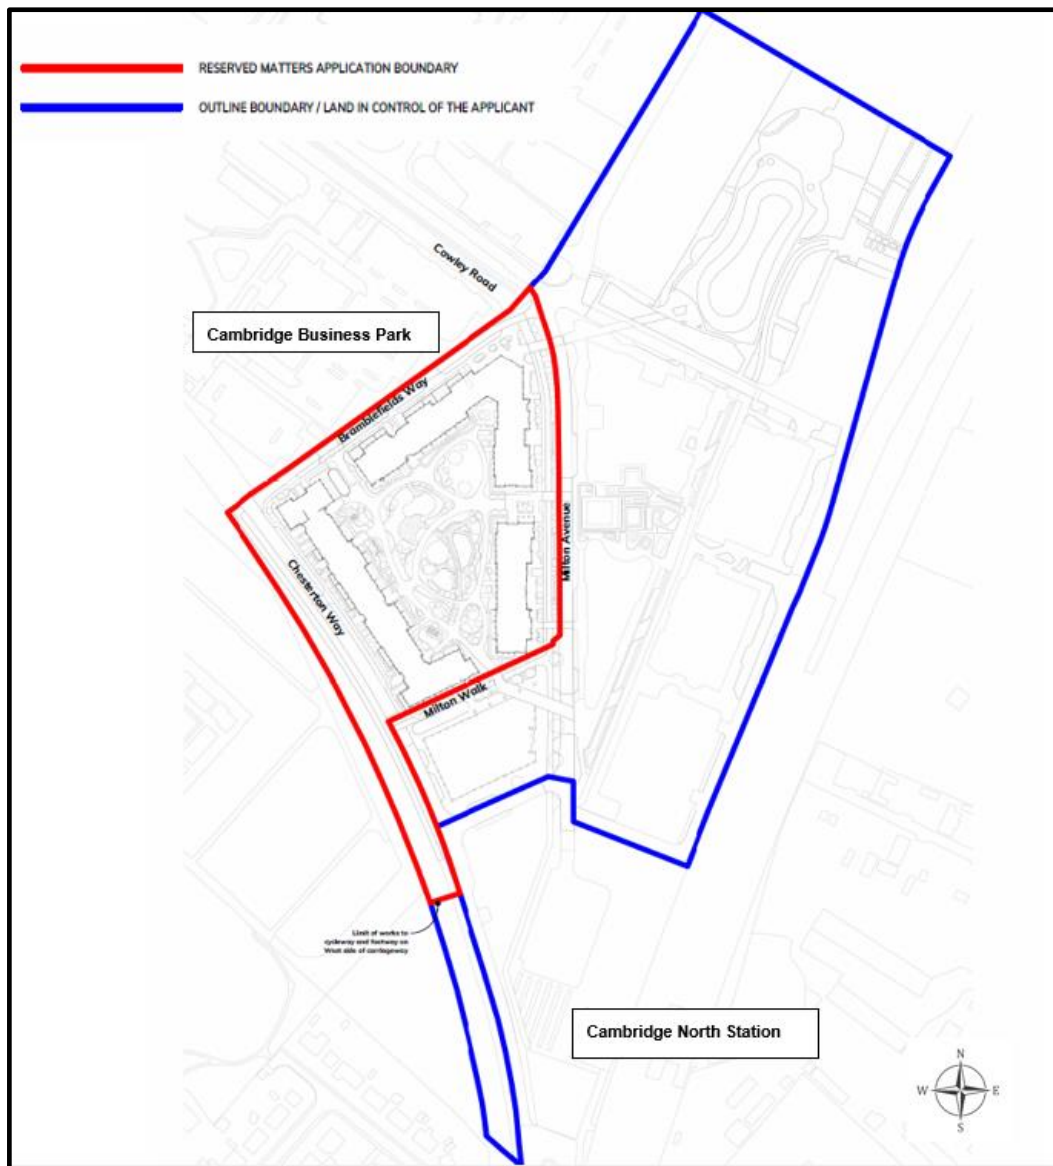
Application Site and wider CNM scheme boundary (adapted) (Source – Franklin Ellis Architects, 2026).
